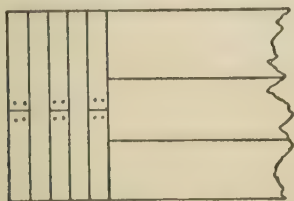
Method of laying a thin overfloor of narrow boards over an old floor
